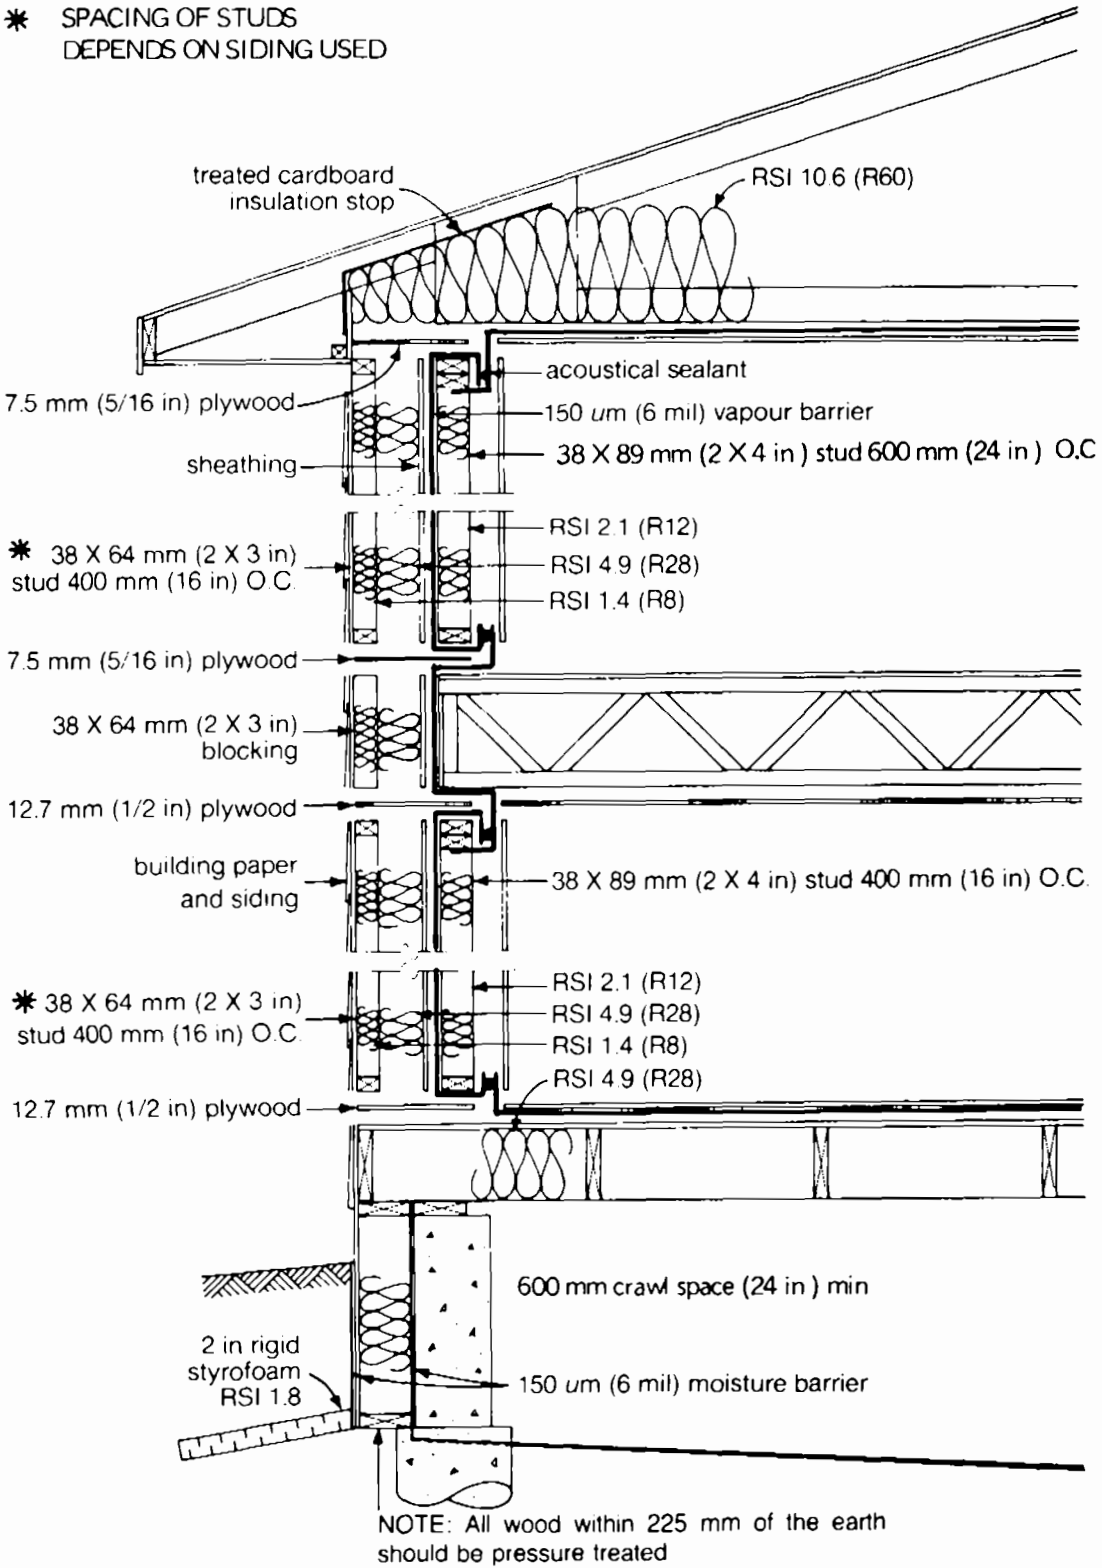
Wall section of double stud design – grade beam and piling foundation.
